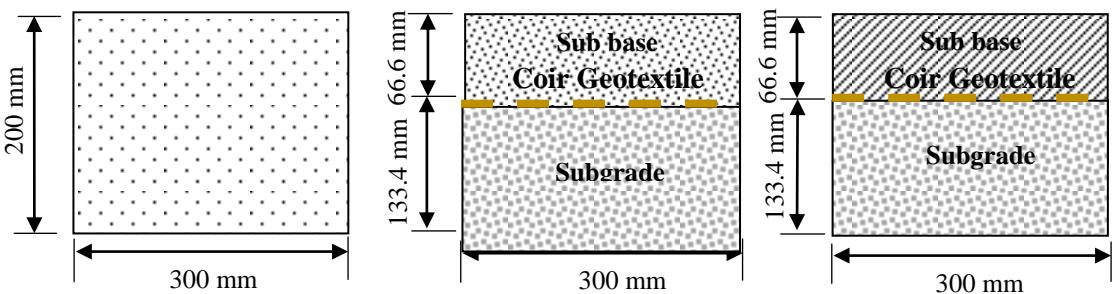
Reinforced and unreinforced pavement model layers at sub-base layer II
